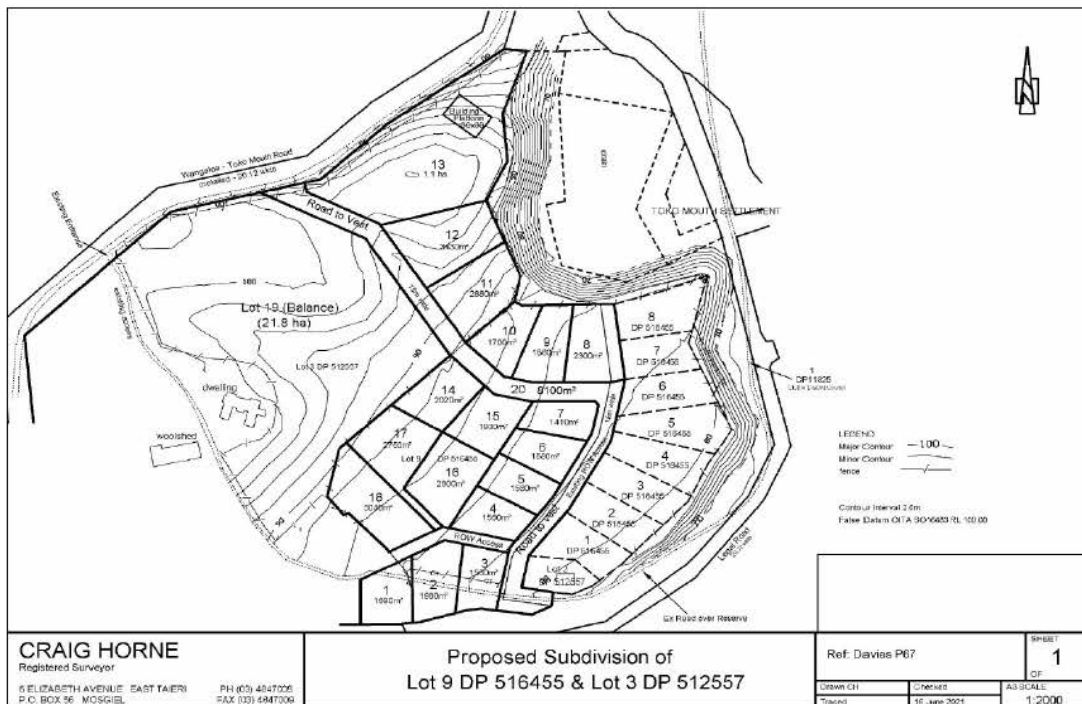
The proposed development, comprising 19 new lots, with 18 new residential lots and the remainder of the property with existing dwelling, outbuildings and farmland forming Lot 19. (Proposed Subdivision of Lot 9 DP 516455 & Lot 3 DP 512557, Craig Horne, version dated 16 June 2021).
